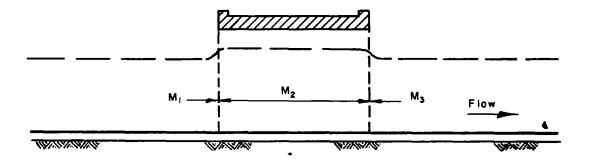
Longitudinal section along centerline of channel indicates three locations: I - immediately upstream, II - Under bridge, III - Immediately downstream.
